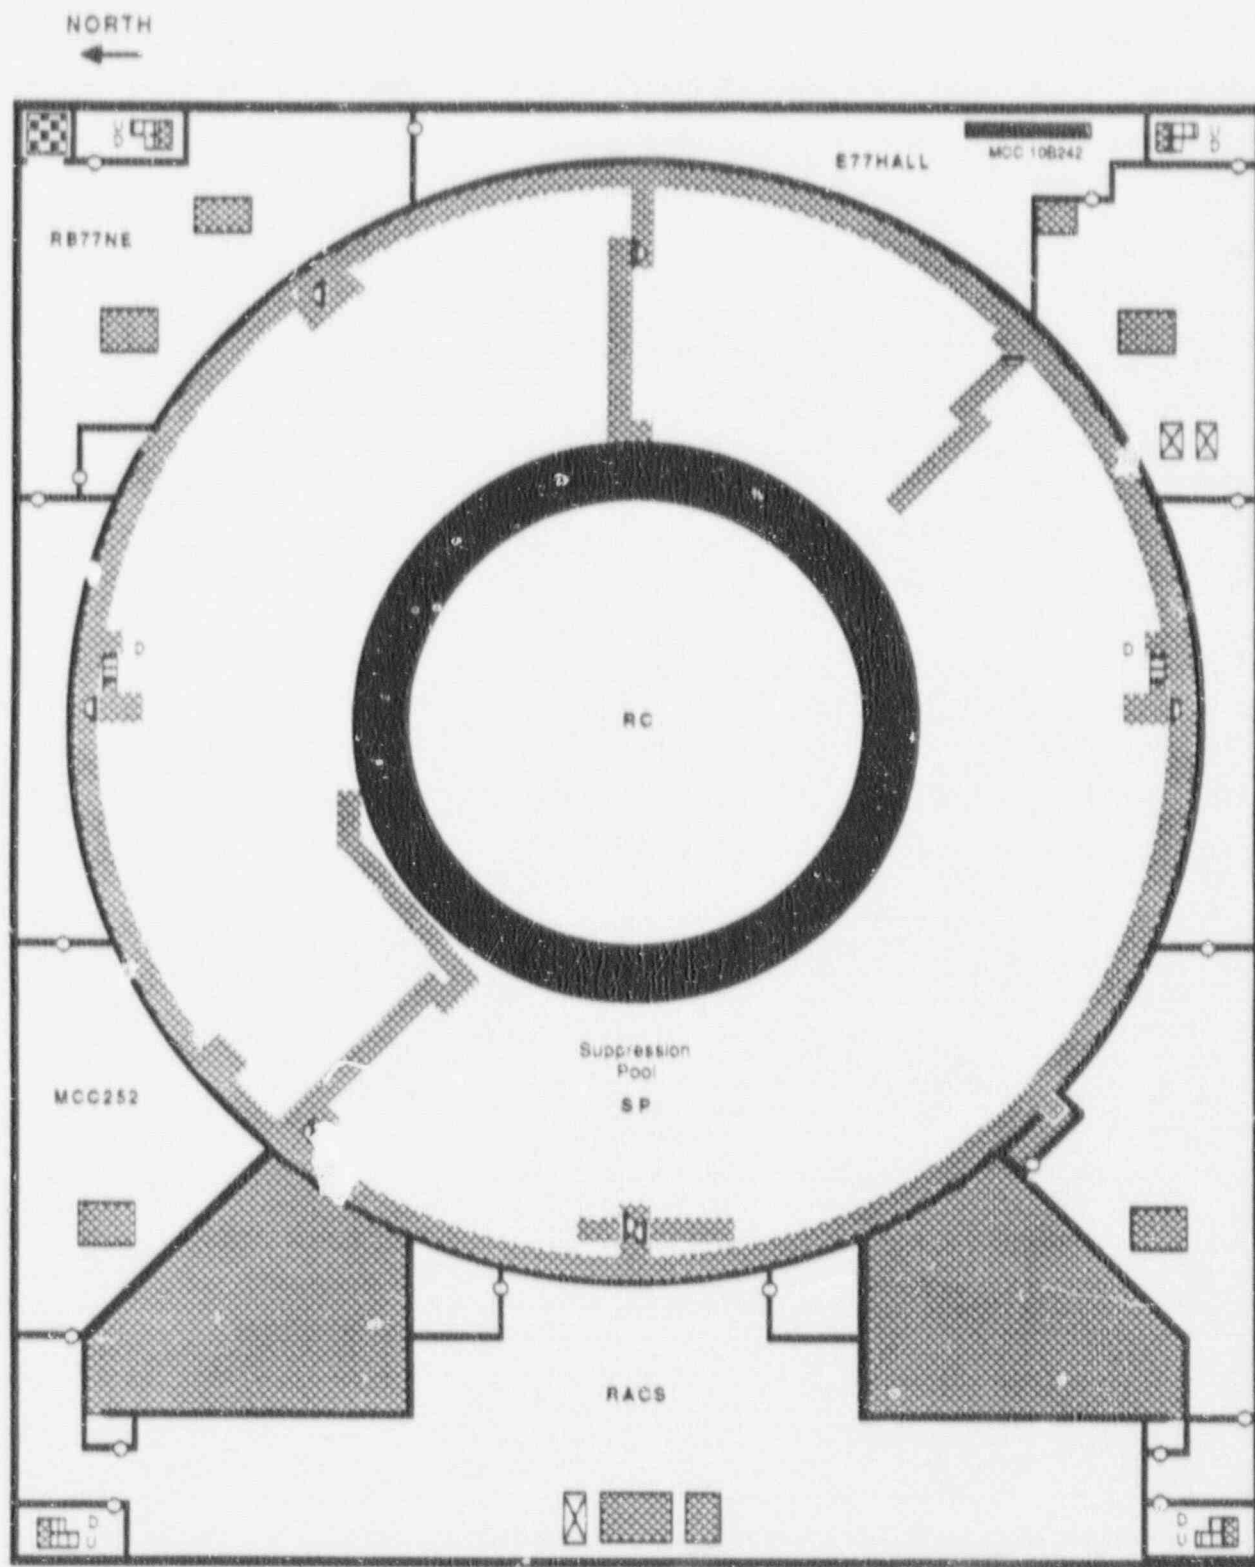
Hope Creek Reactor Building Elevation 77'-0"
